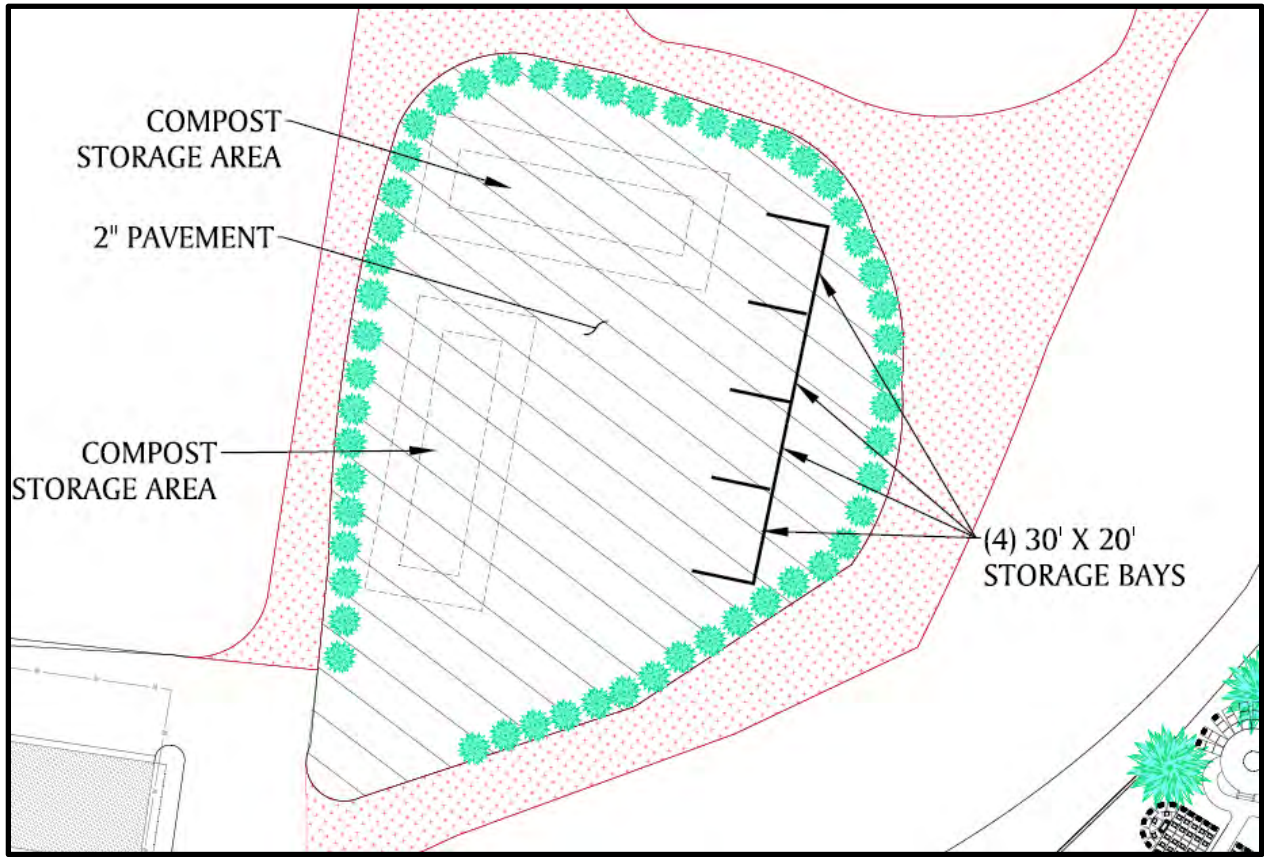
Plan View Area 10 Additional Storage
